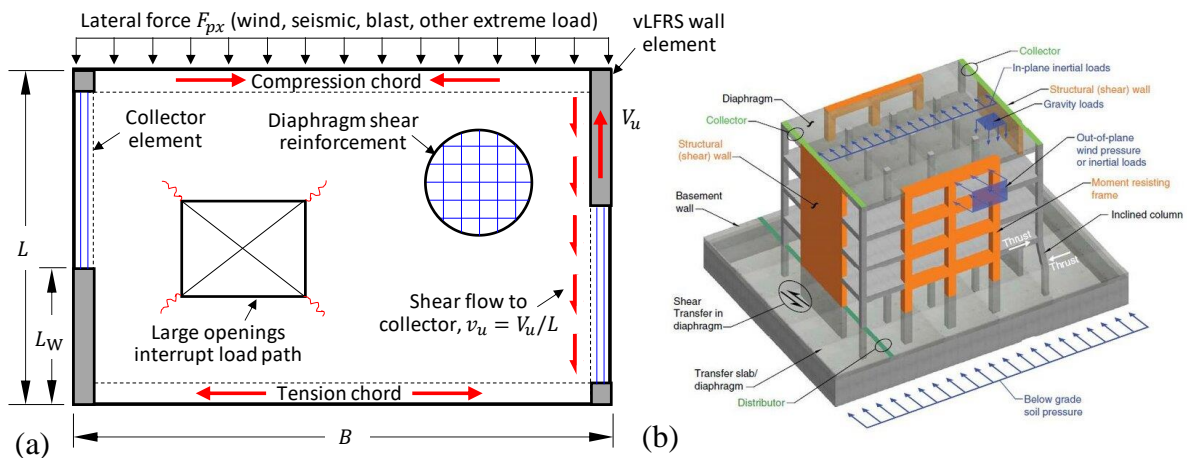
Reinforced Concrete hLFRS: (a) Components of the hLFRS; (b) Schematic of the Lateral Force Resisting System in a Typical Concrete Building (ACI 2019).
